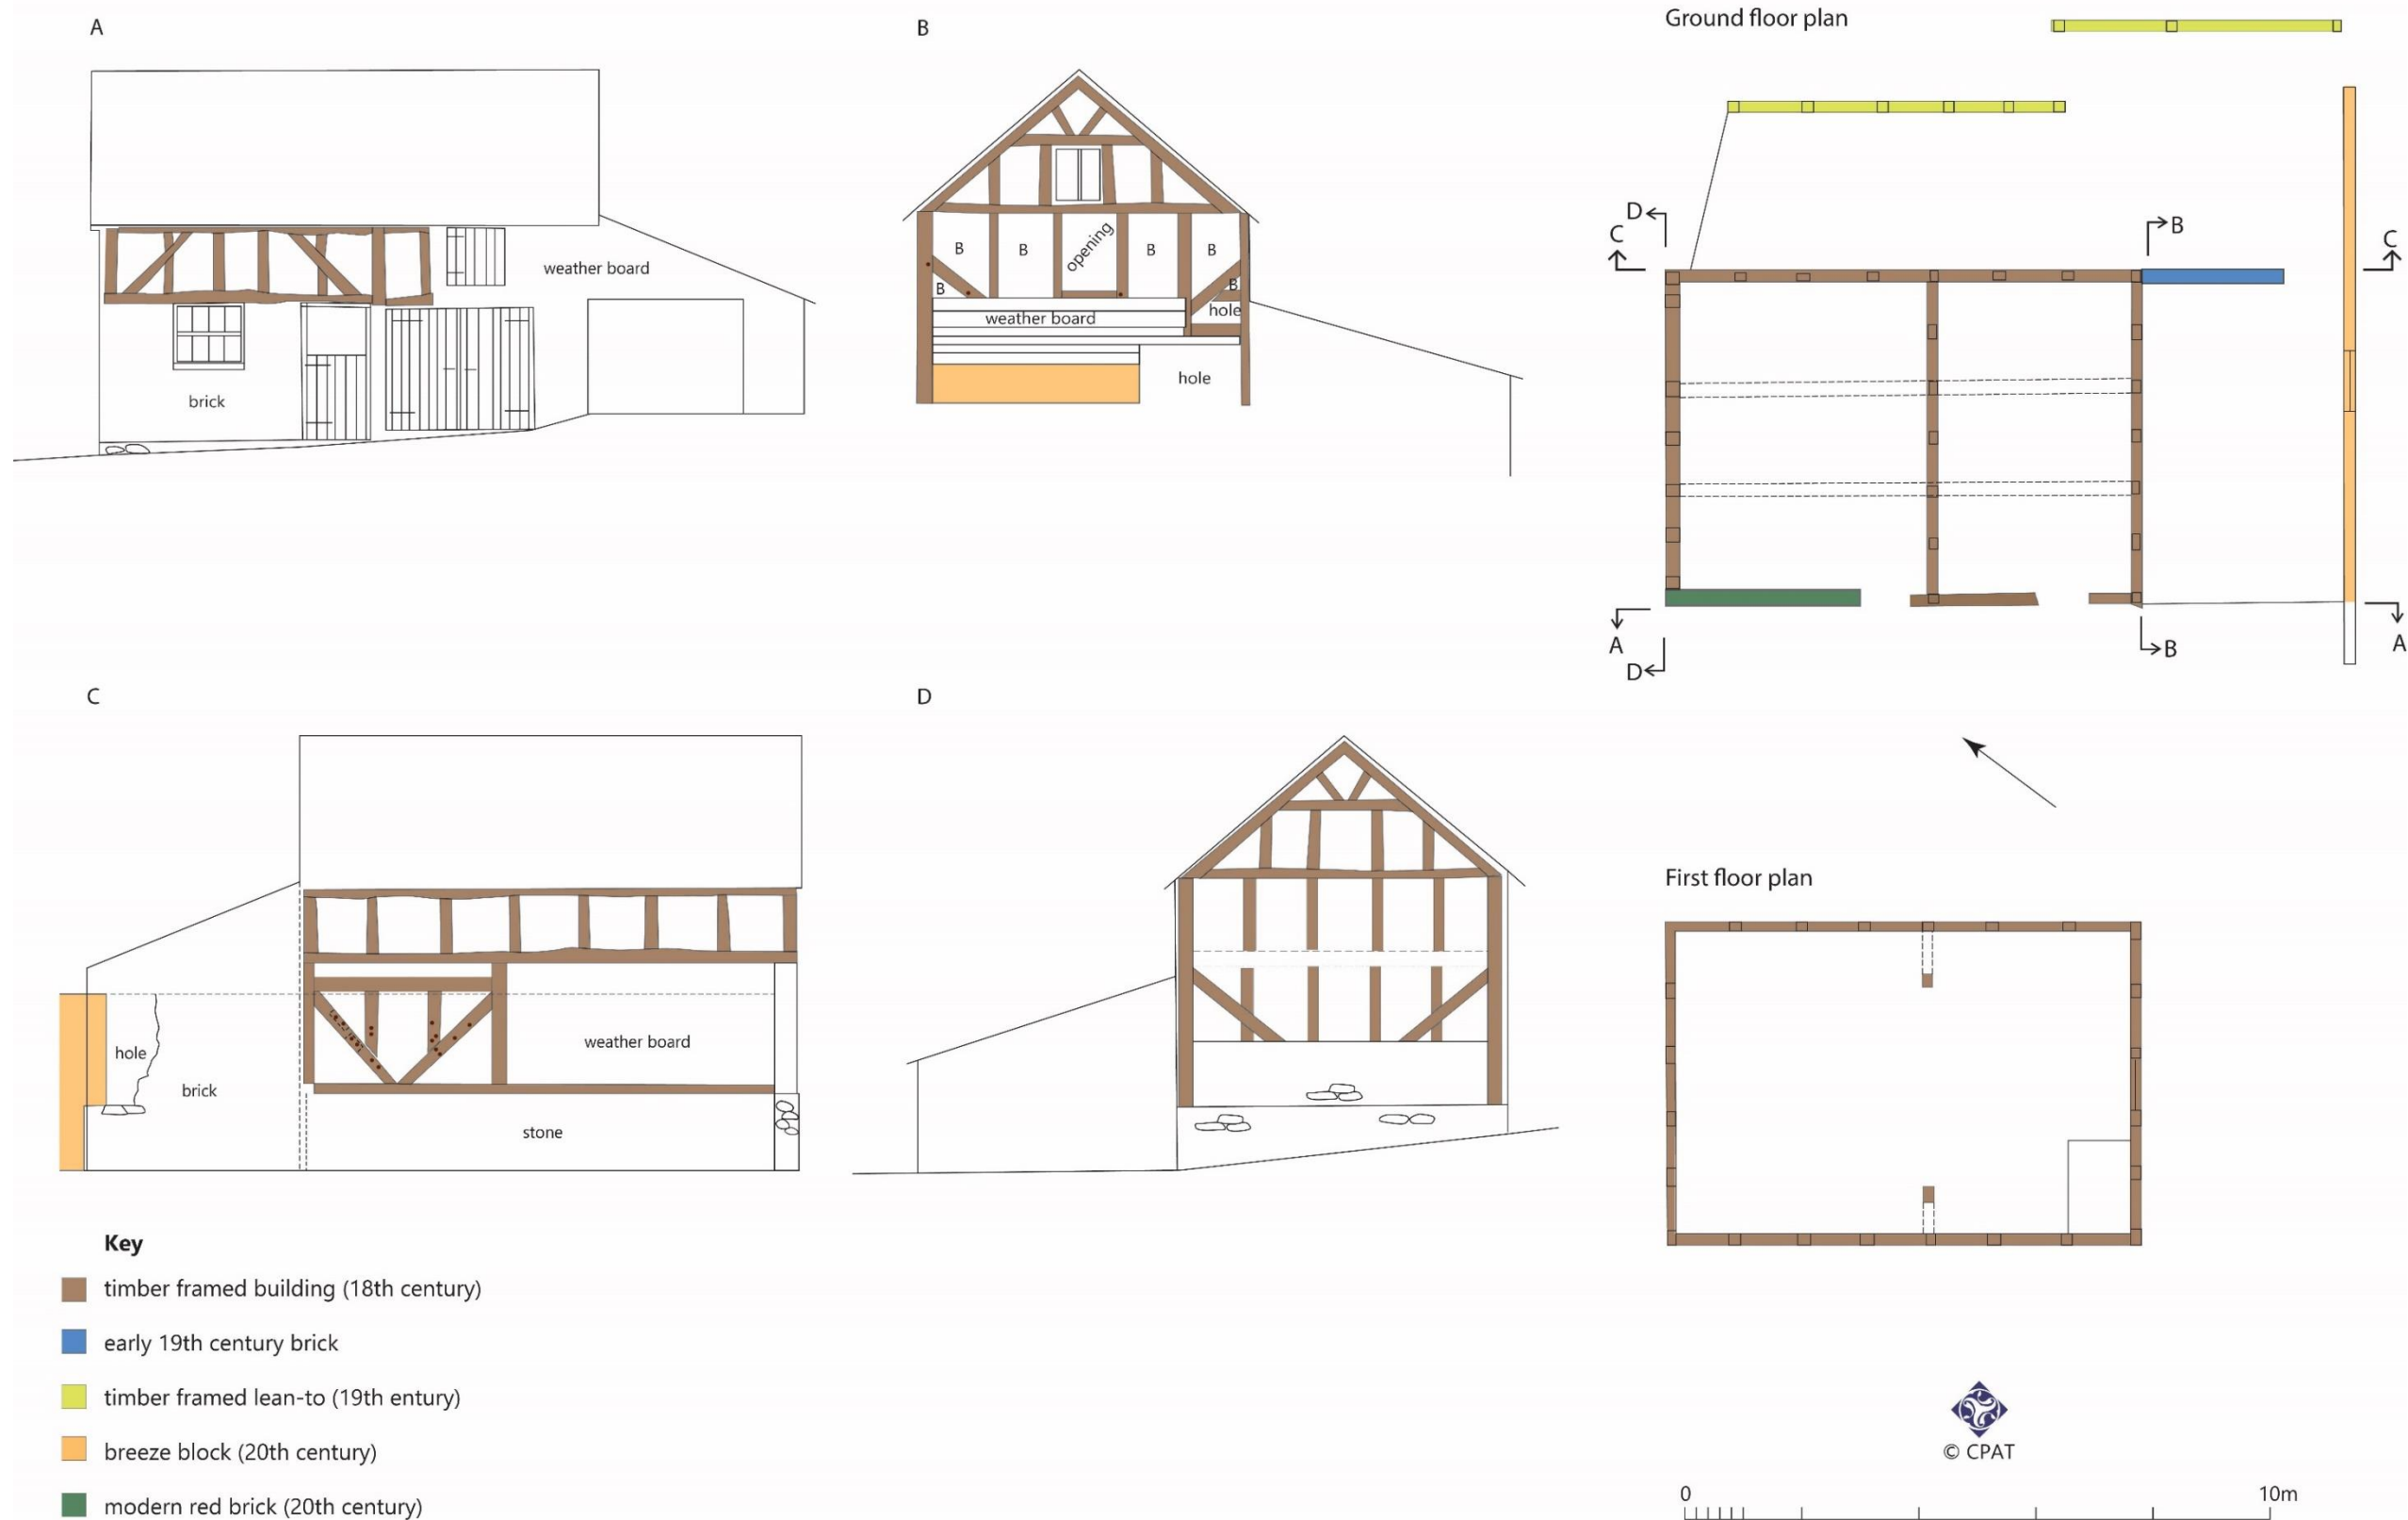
Building B elevations and phase plan (based on existing architects drawings supplied by the client)
